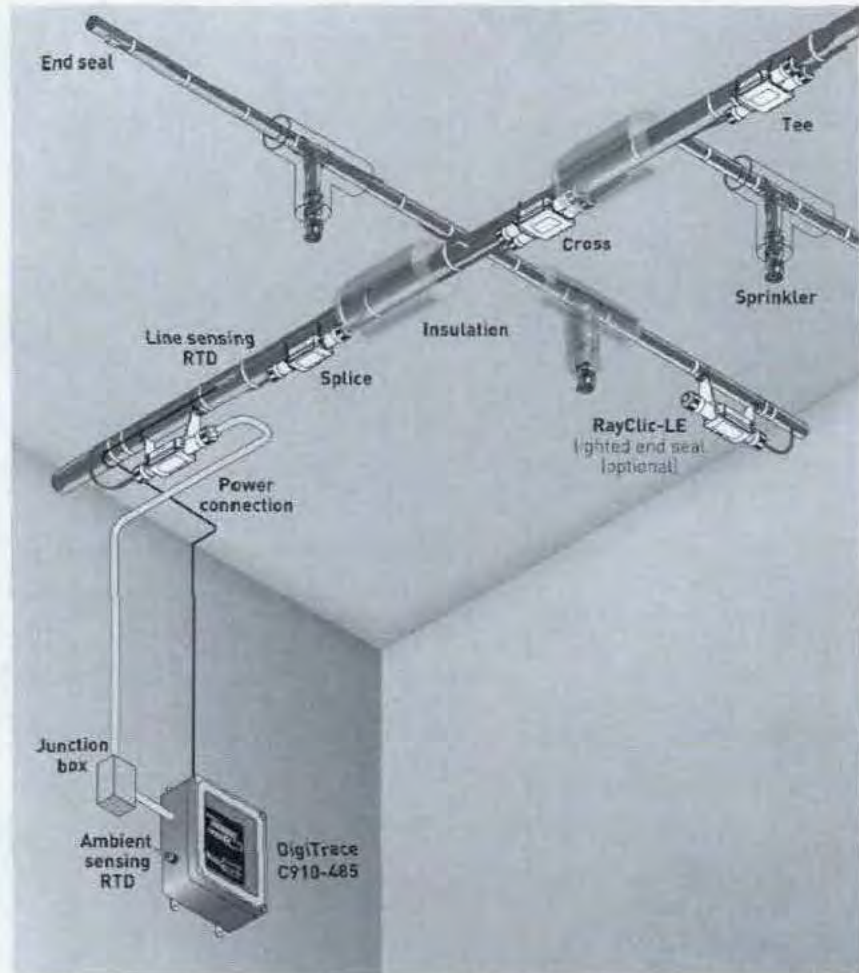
Typical fire suppression system for branch lines with sprinklers
